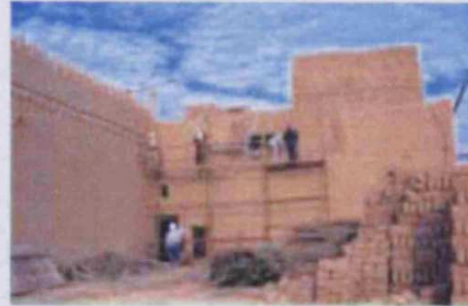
Walls constructed by using sun dried mud bricks. Source: AHC. ⁽⁵⁻¹⁵⁾.
